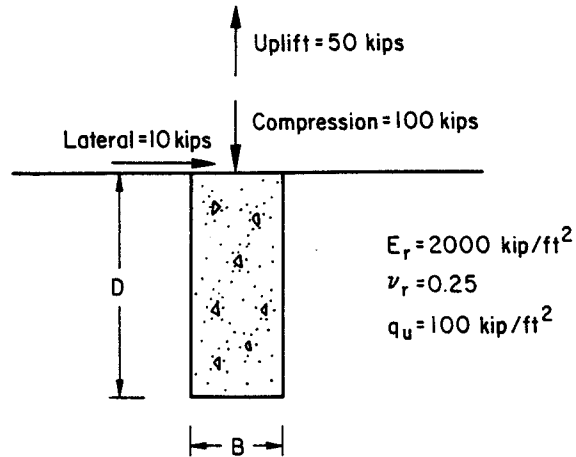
Loading and Rock Mass Properties for Lattice Tower Foundation
